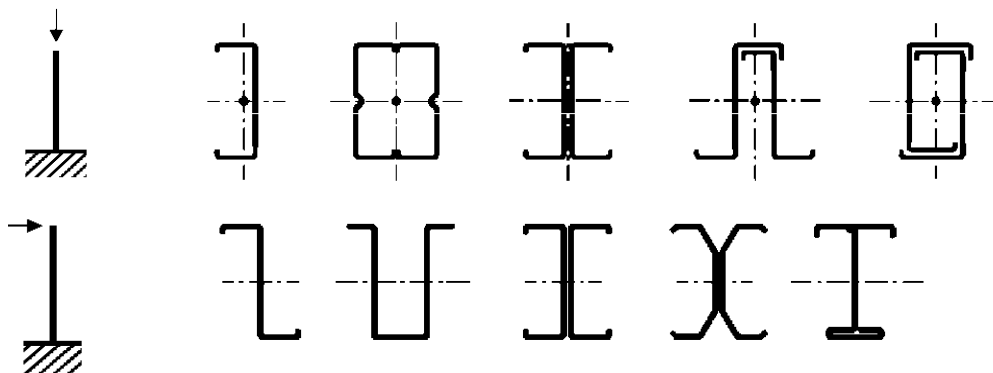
Cross section of steel cold-formed steel profiles for beams and columns 1993-1-1, (2005).
